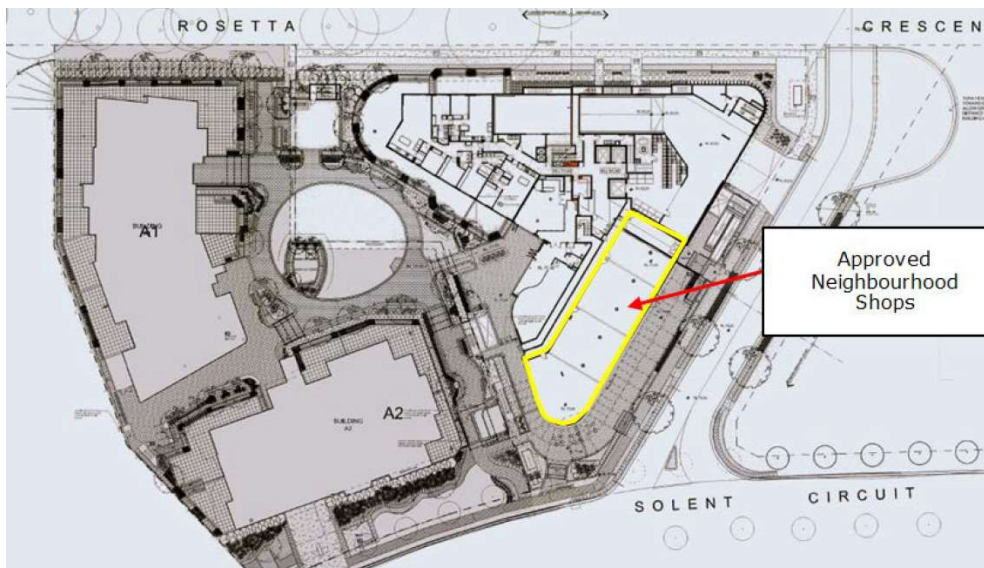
Location of subject floor space in approved development (outlined in yellow)
